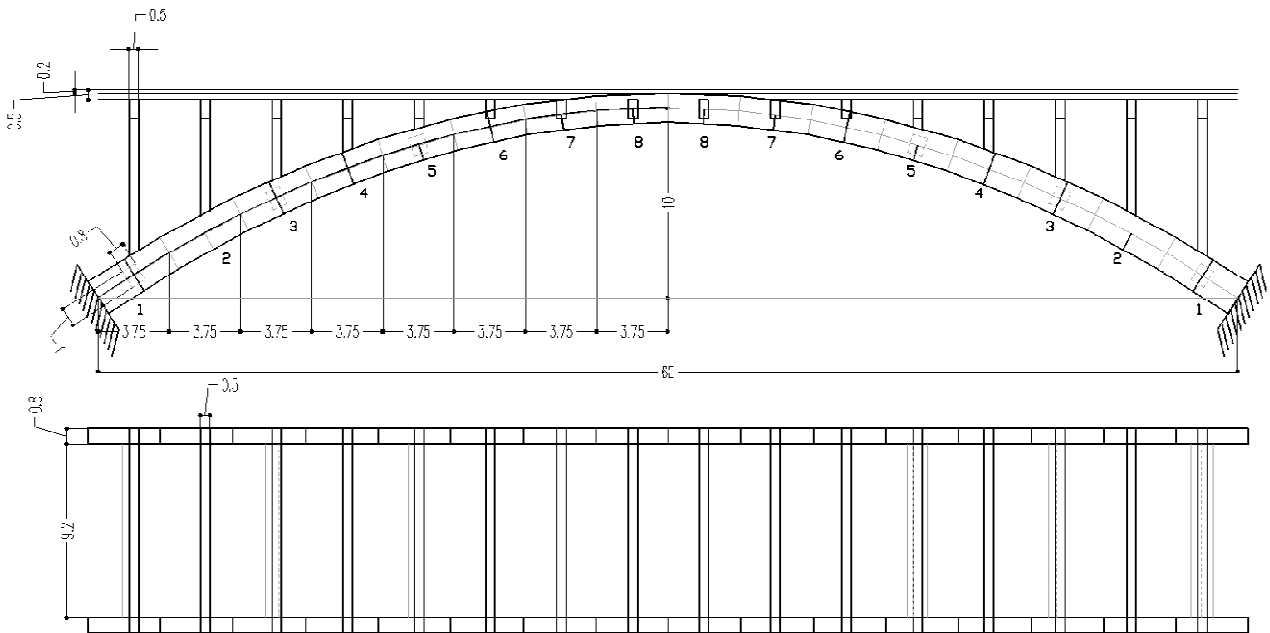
Plan and section of the reinforced concrete of the mid 20th century bridge.
